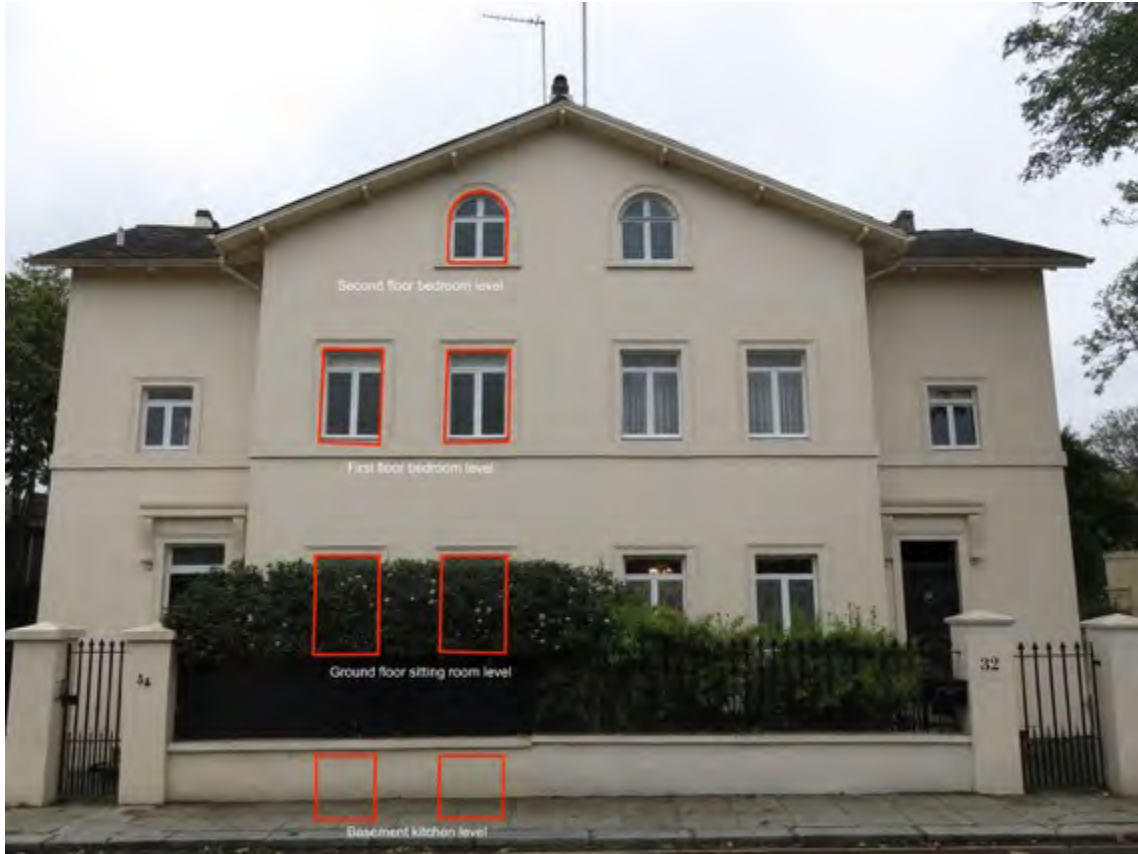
A view of 34 Park Village East. Windows where internal secondary glazing will be installed are annotated in red.
